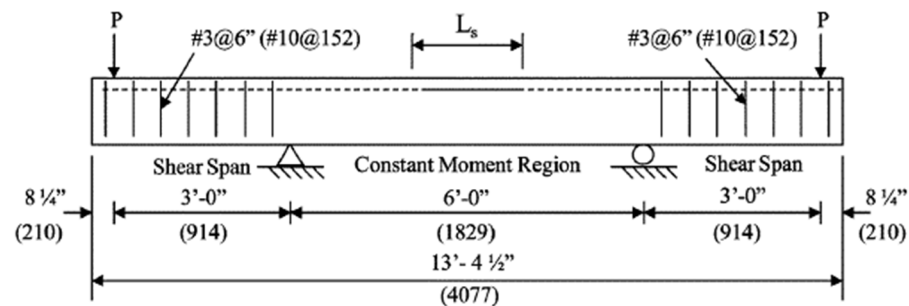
The geometric dimensions and reinforcement details of beam specimens tested by (Mosley et al. 2008)
